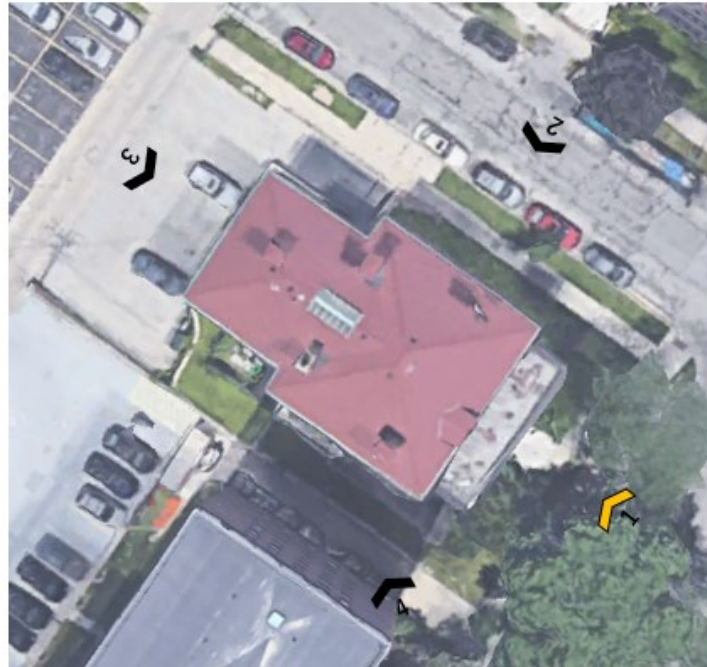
Exterior Photo Key Plan (Photos 1-4)
